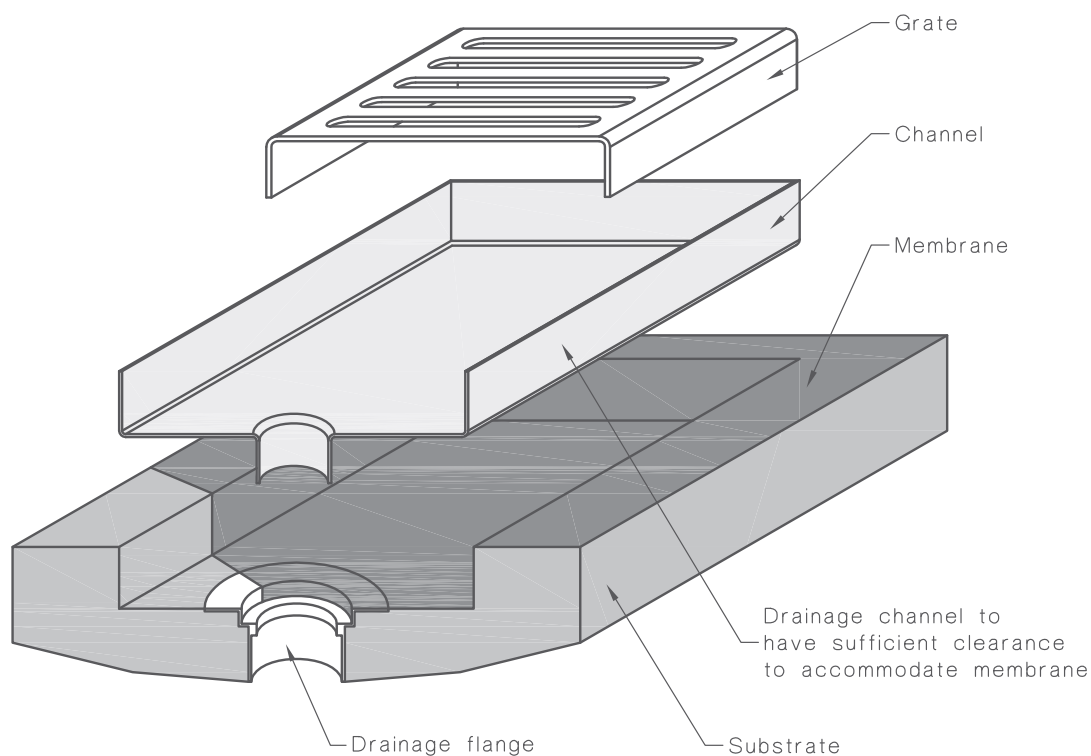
TYPICAL MEMBRANE TERMINATION AT DRAINAGE CHANNEL
